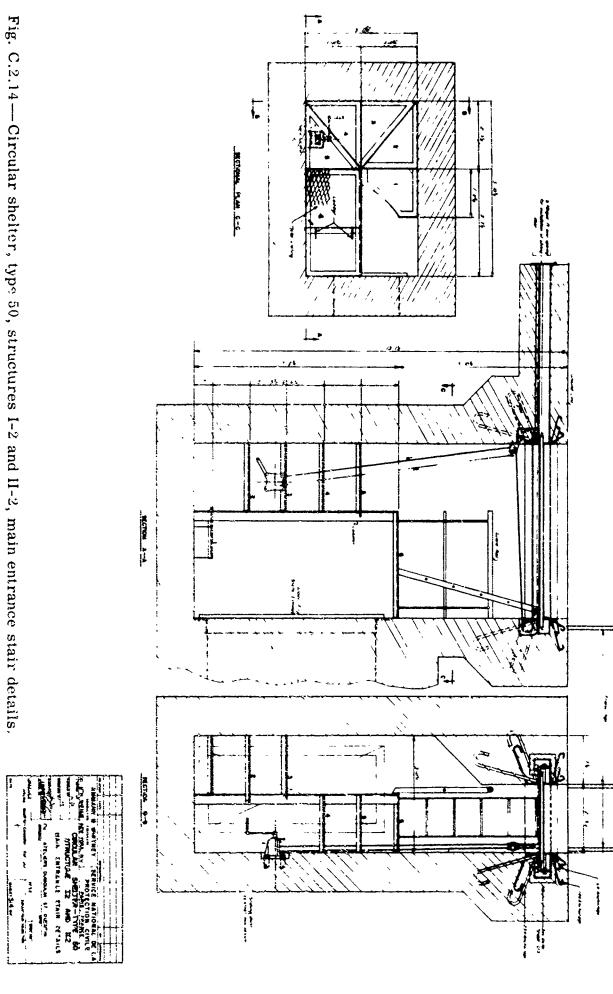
Circular shelter, type 50, structures I-2 and II-2, main entrance stair details.
